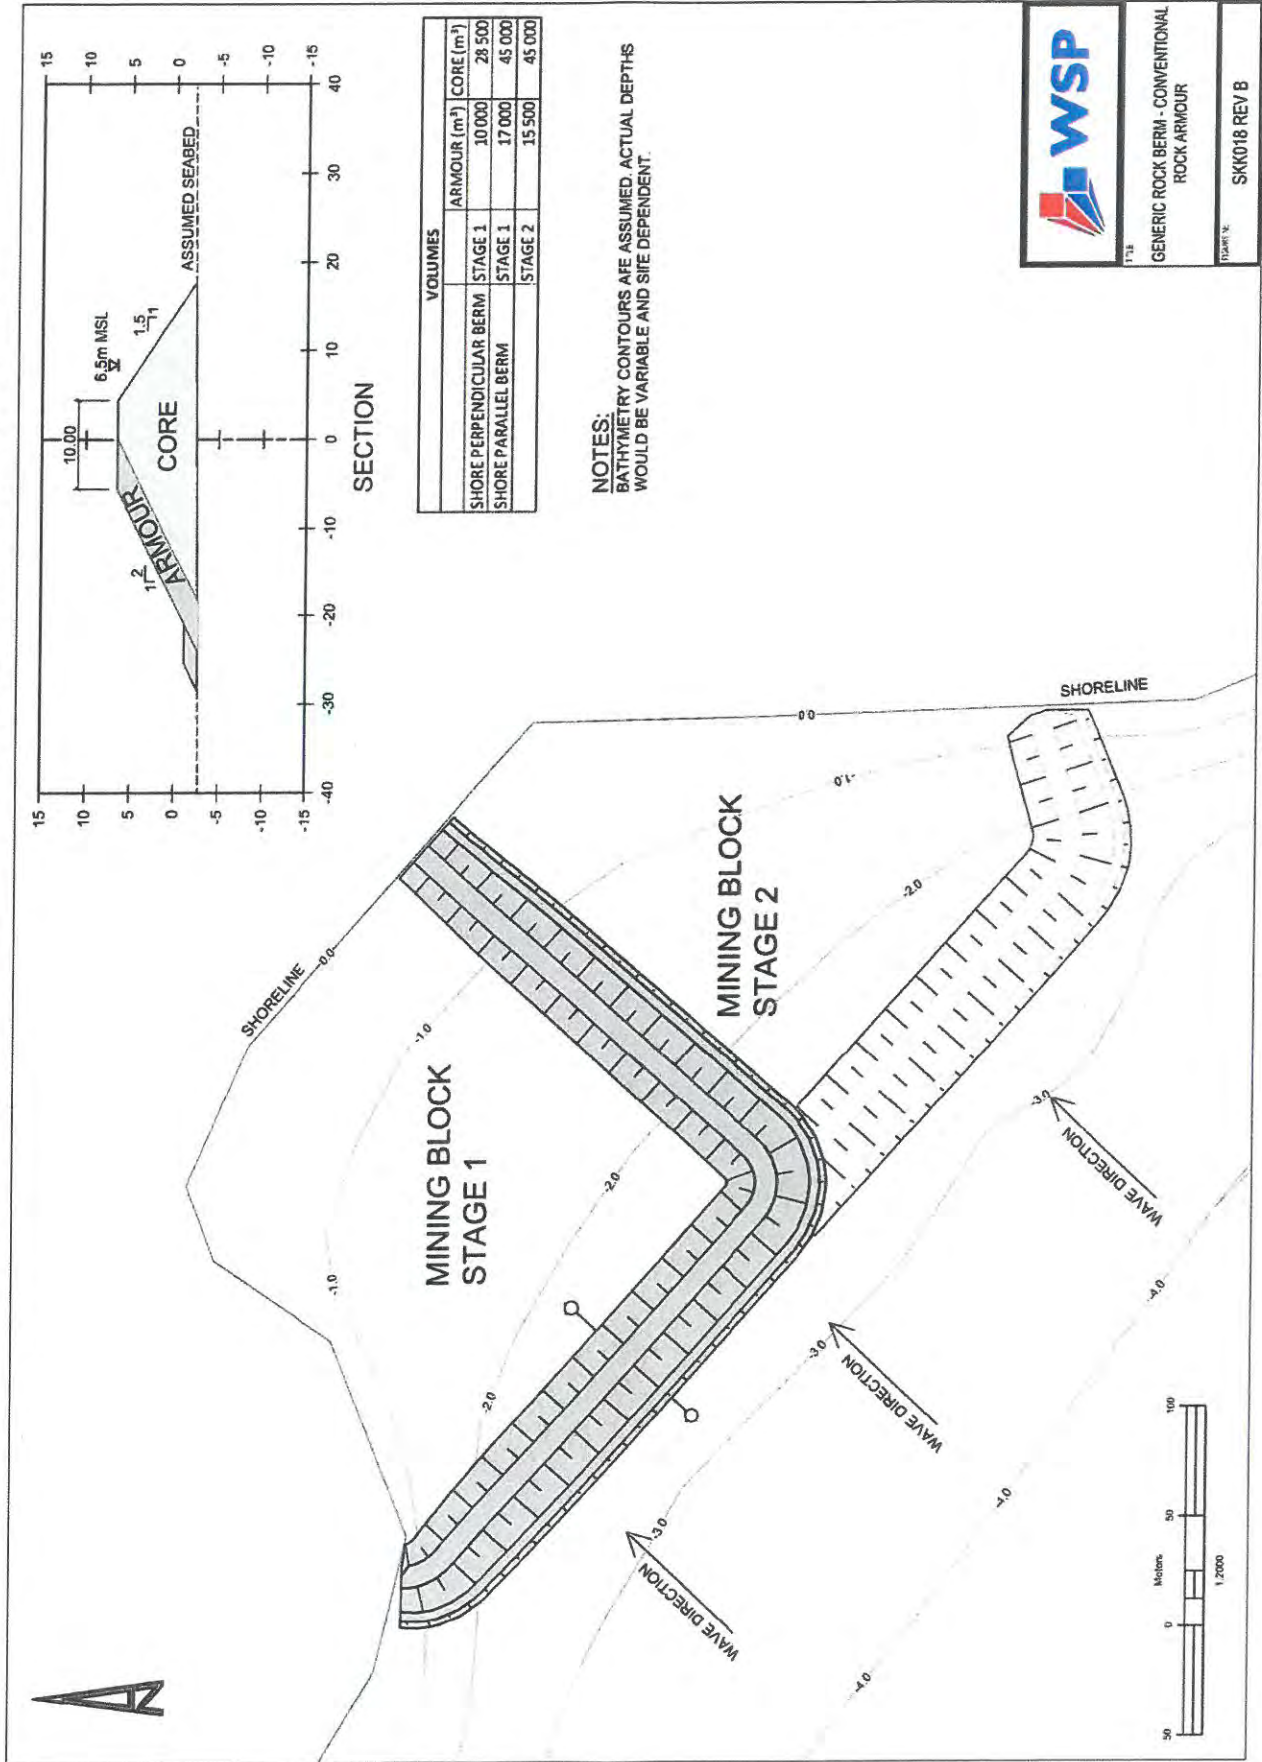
Layout of generic rock berm designs to be applied on the rocky shoreline
